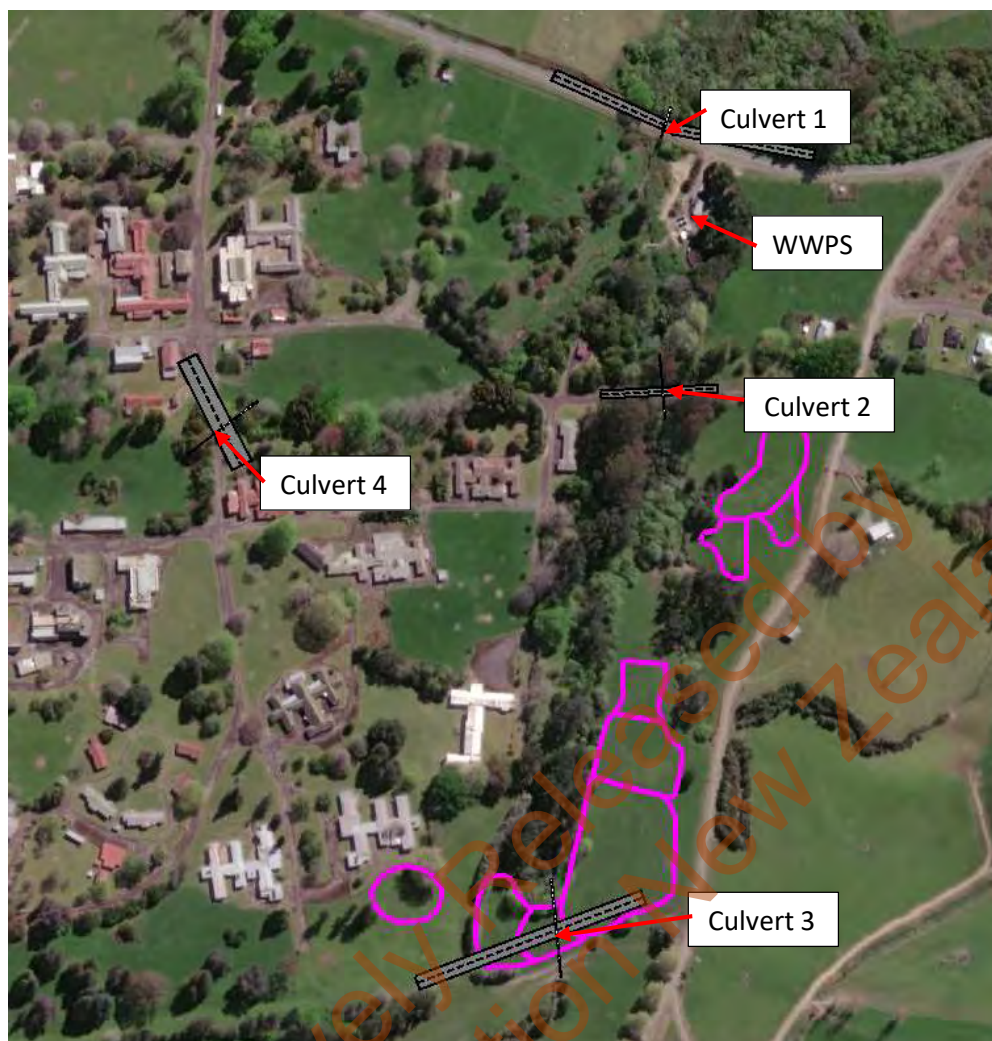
Culvert and Wastewater Pump Station (WWPS) Locations; existing disposal site extent shown in purple (as of June 2024)
